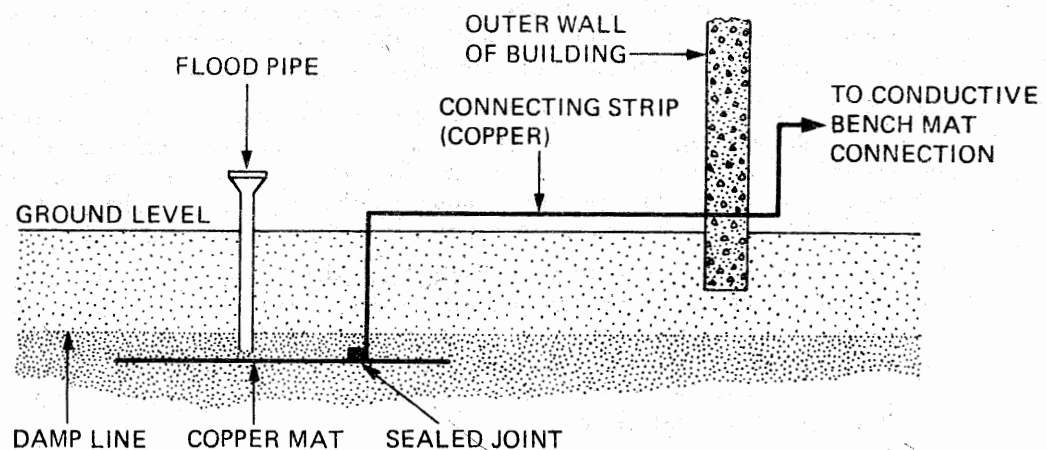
TYPICAL GROUNDING ARRANGEMENT
